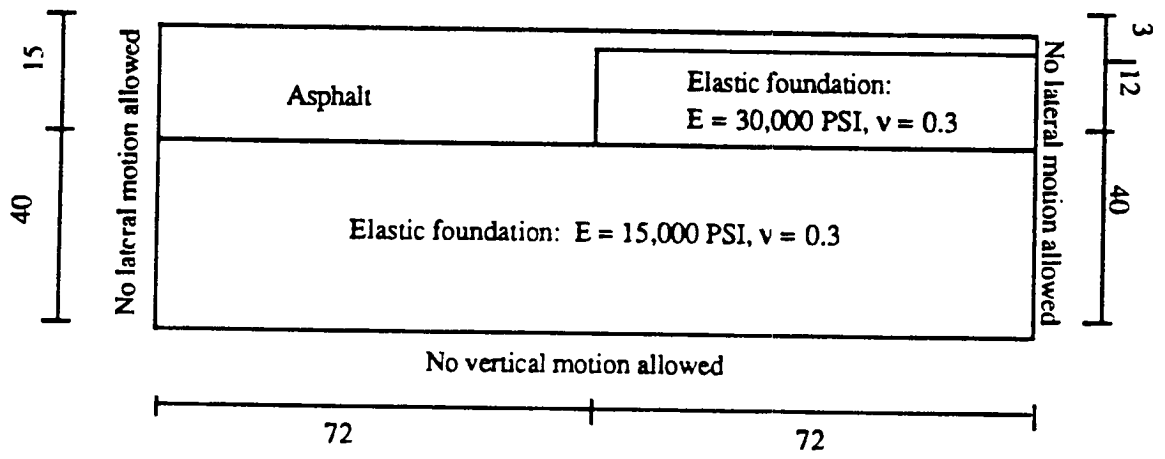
Schematic view of cross section of 15 in. thick pavement.
